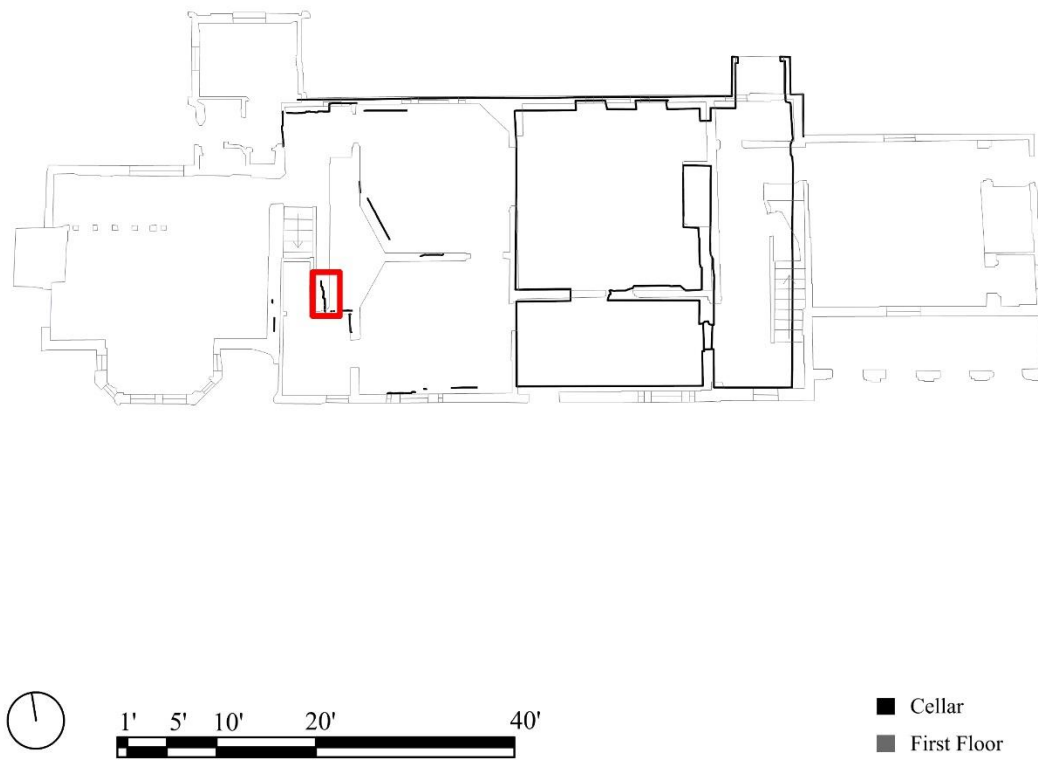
The cellar floor plan is overlaid over the first-floor plan. By comparing the chimney base in the cellar to the back wall of the chimney on the first floor, it is confirmed that the wall seen from the hole in the western wing with English bond is in fact the western wall of the chimney base.
